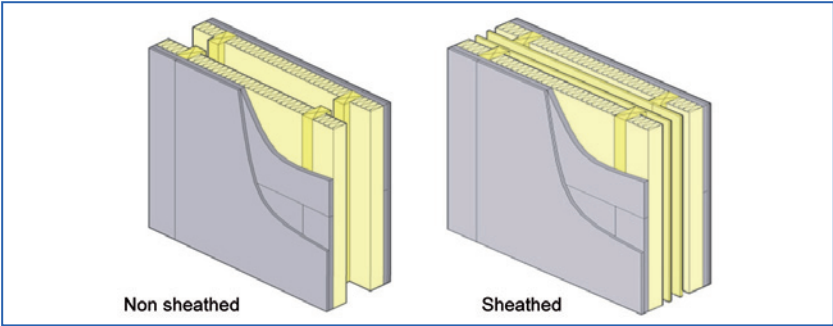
Examples of twin frame timber frame separating walls non-sheathed and sheathed.
